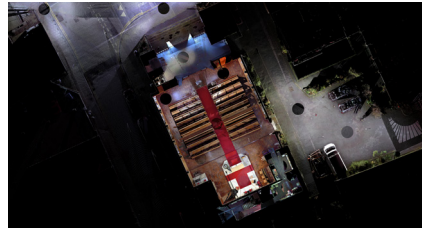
Ground floor plan of the church. (Source: courtesy of E. Savvidis and M. Daouti).
